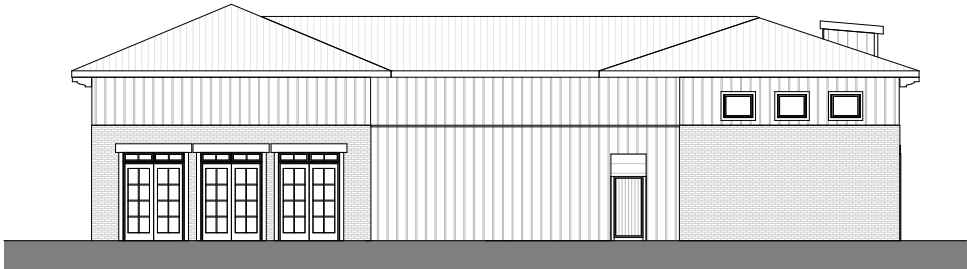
MULTIFAMILY ELEVATIONS
